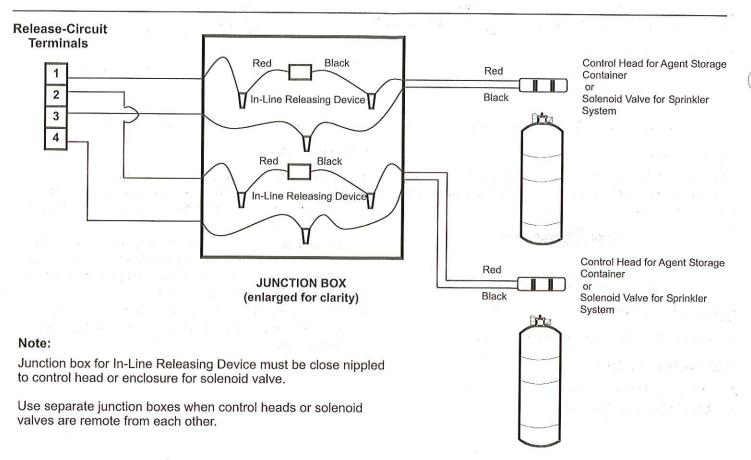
Dual-Control-Head or -Solenoid Releasing Circuit
